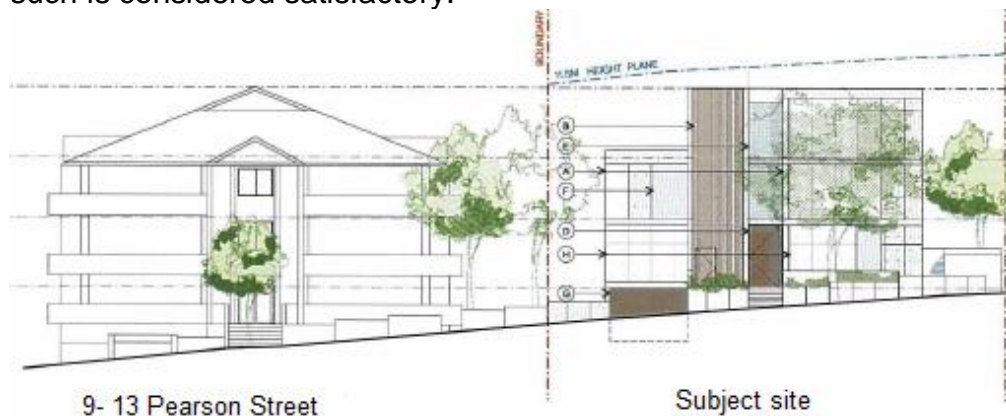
Slope of the land falls from north to south – however the proposed RCF is cut in along the northern elevation and is on the same height plan as 9-13 Pearson Street.
